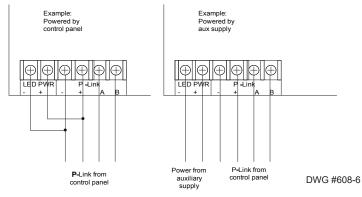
Examples of Wiring a LED-16/LED-16(F) Module to Control Panel or Auxiliary Power Supply
